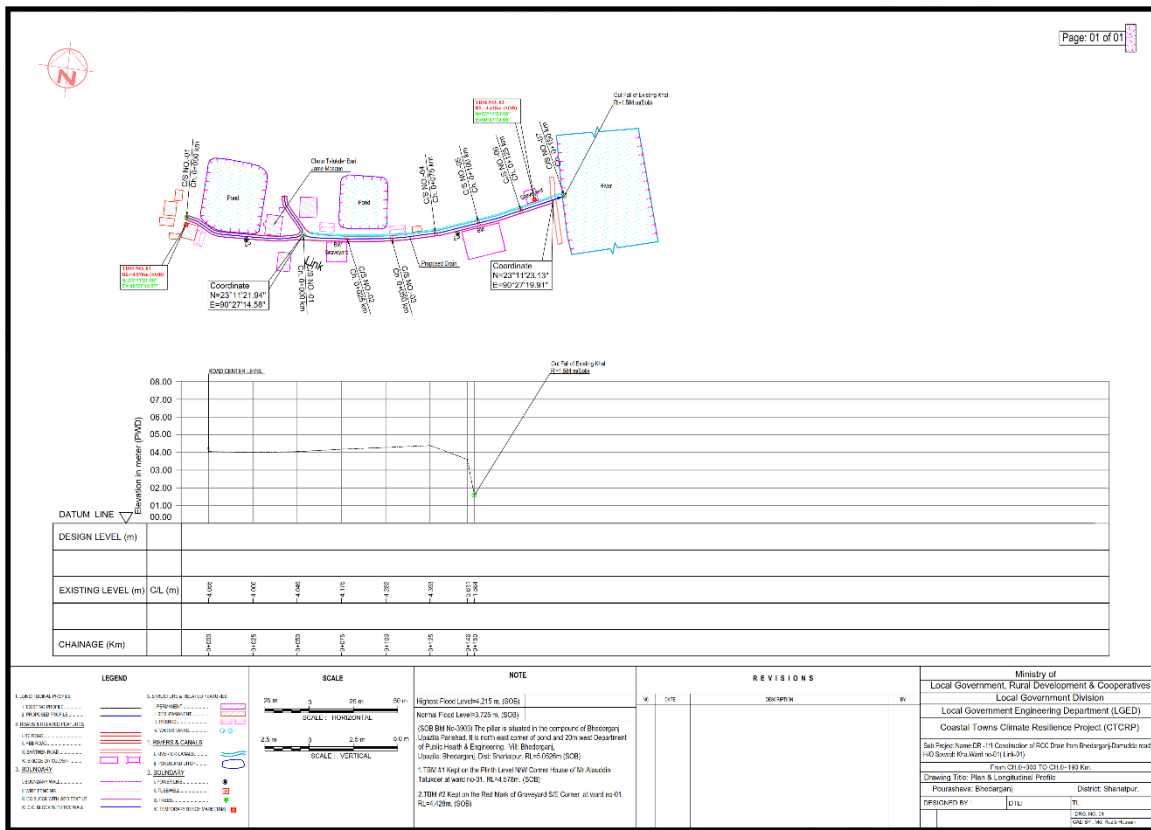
Typical Cross section of Drain and Topographic Site Plan
